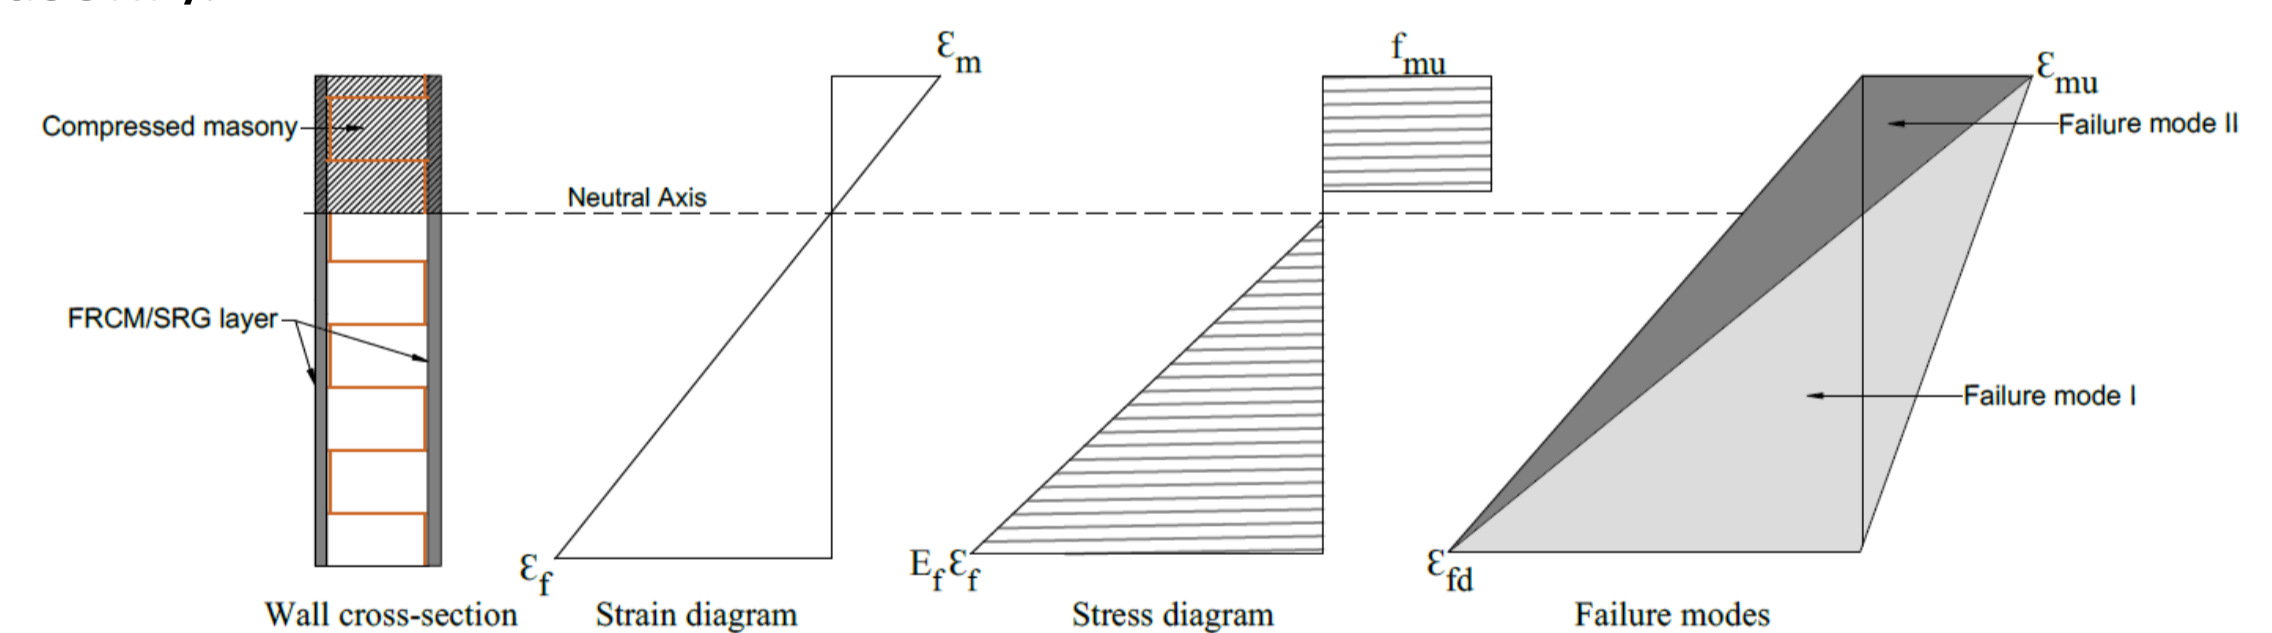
Cross-section of the wall, strain, stress profiles, and failure modes.
